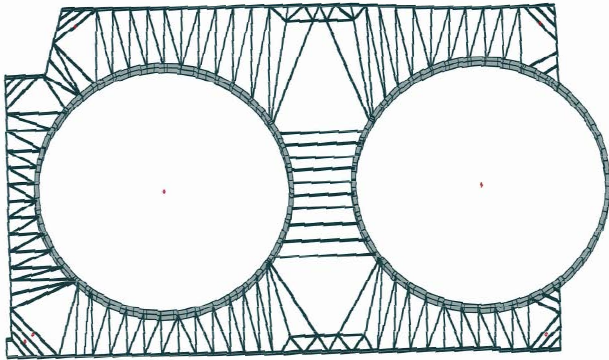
Schematic diagram of prop at 3m below ground level that spans between the two 120m diameter circular walls and the perimeter diaphragm wall
